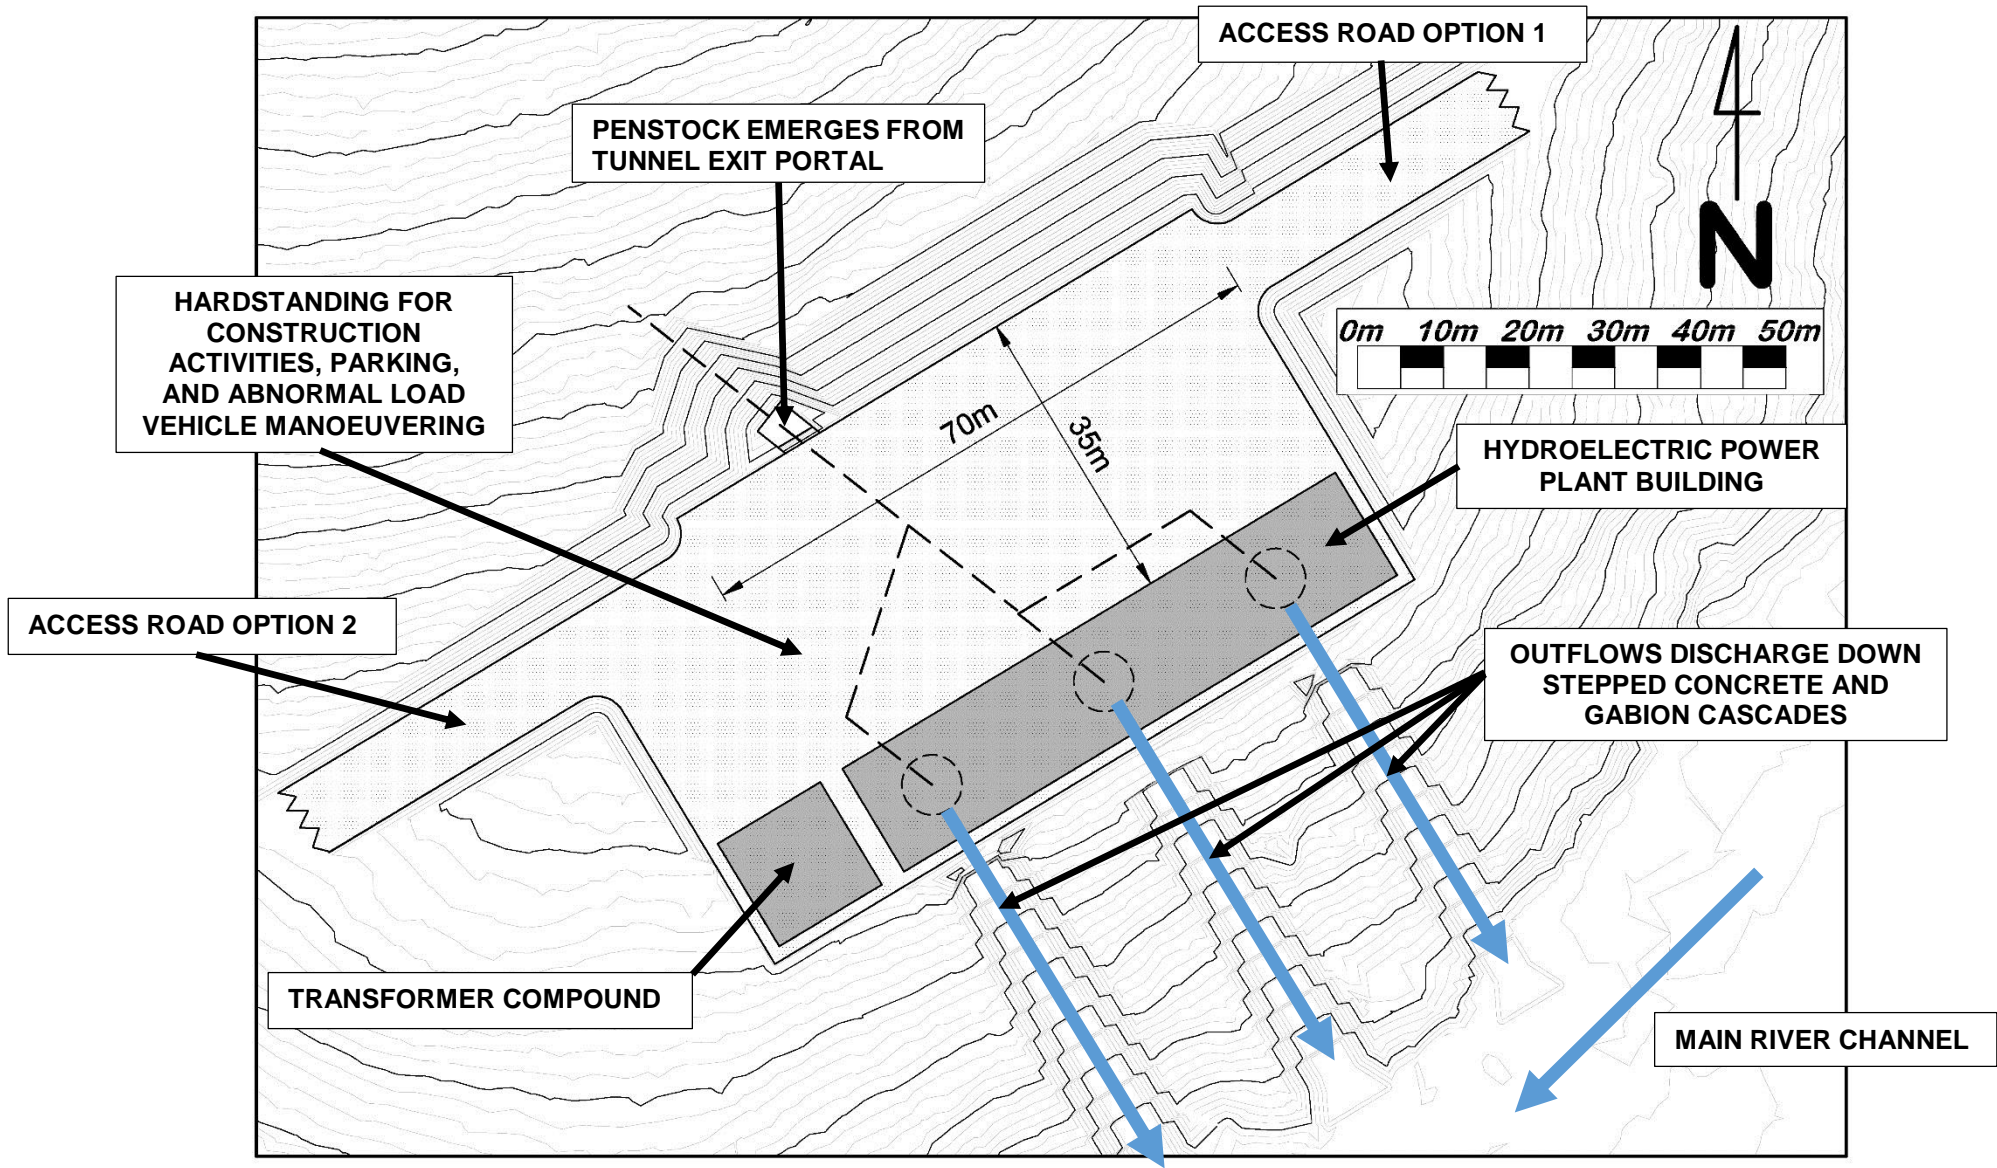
Lalini Main Hydropower Plant Site Layout
